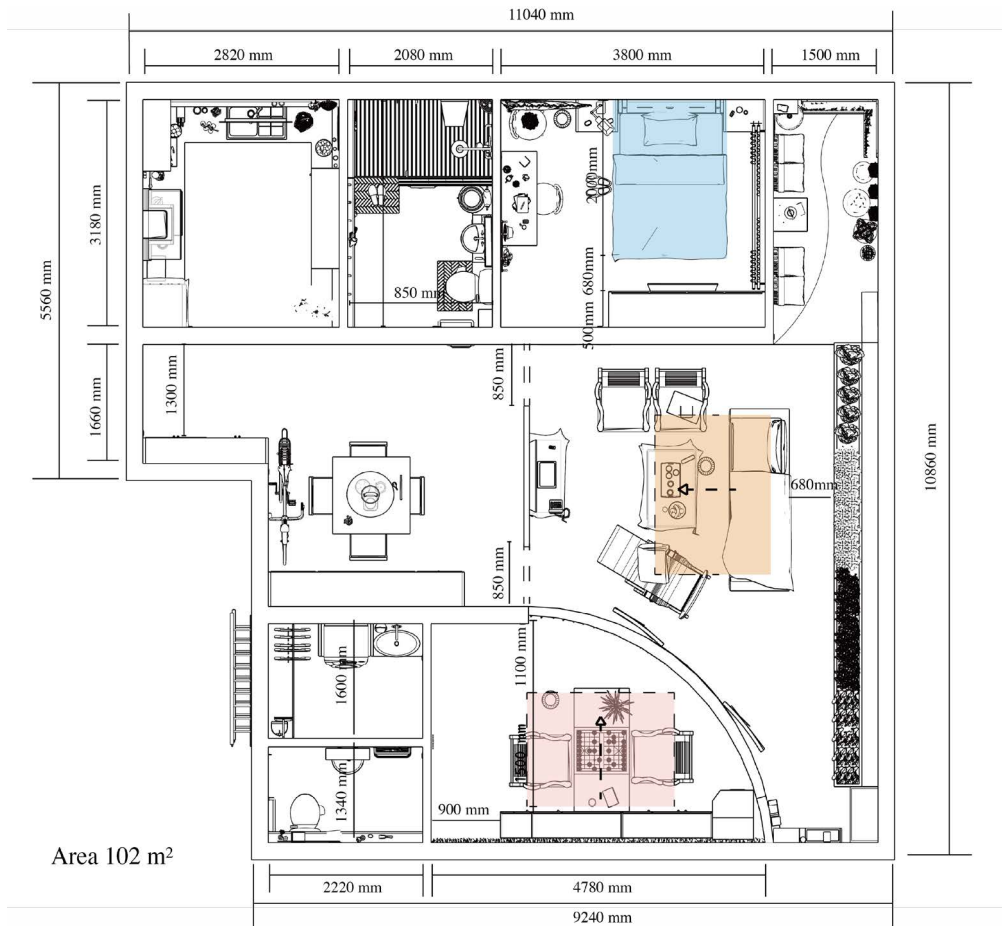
Floor Plan, digital drawing by Qiyu Zuo, 2020.
